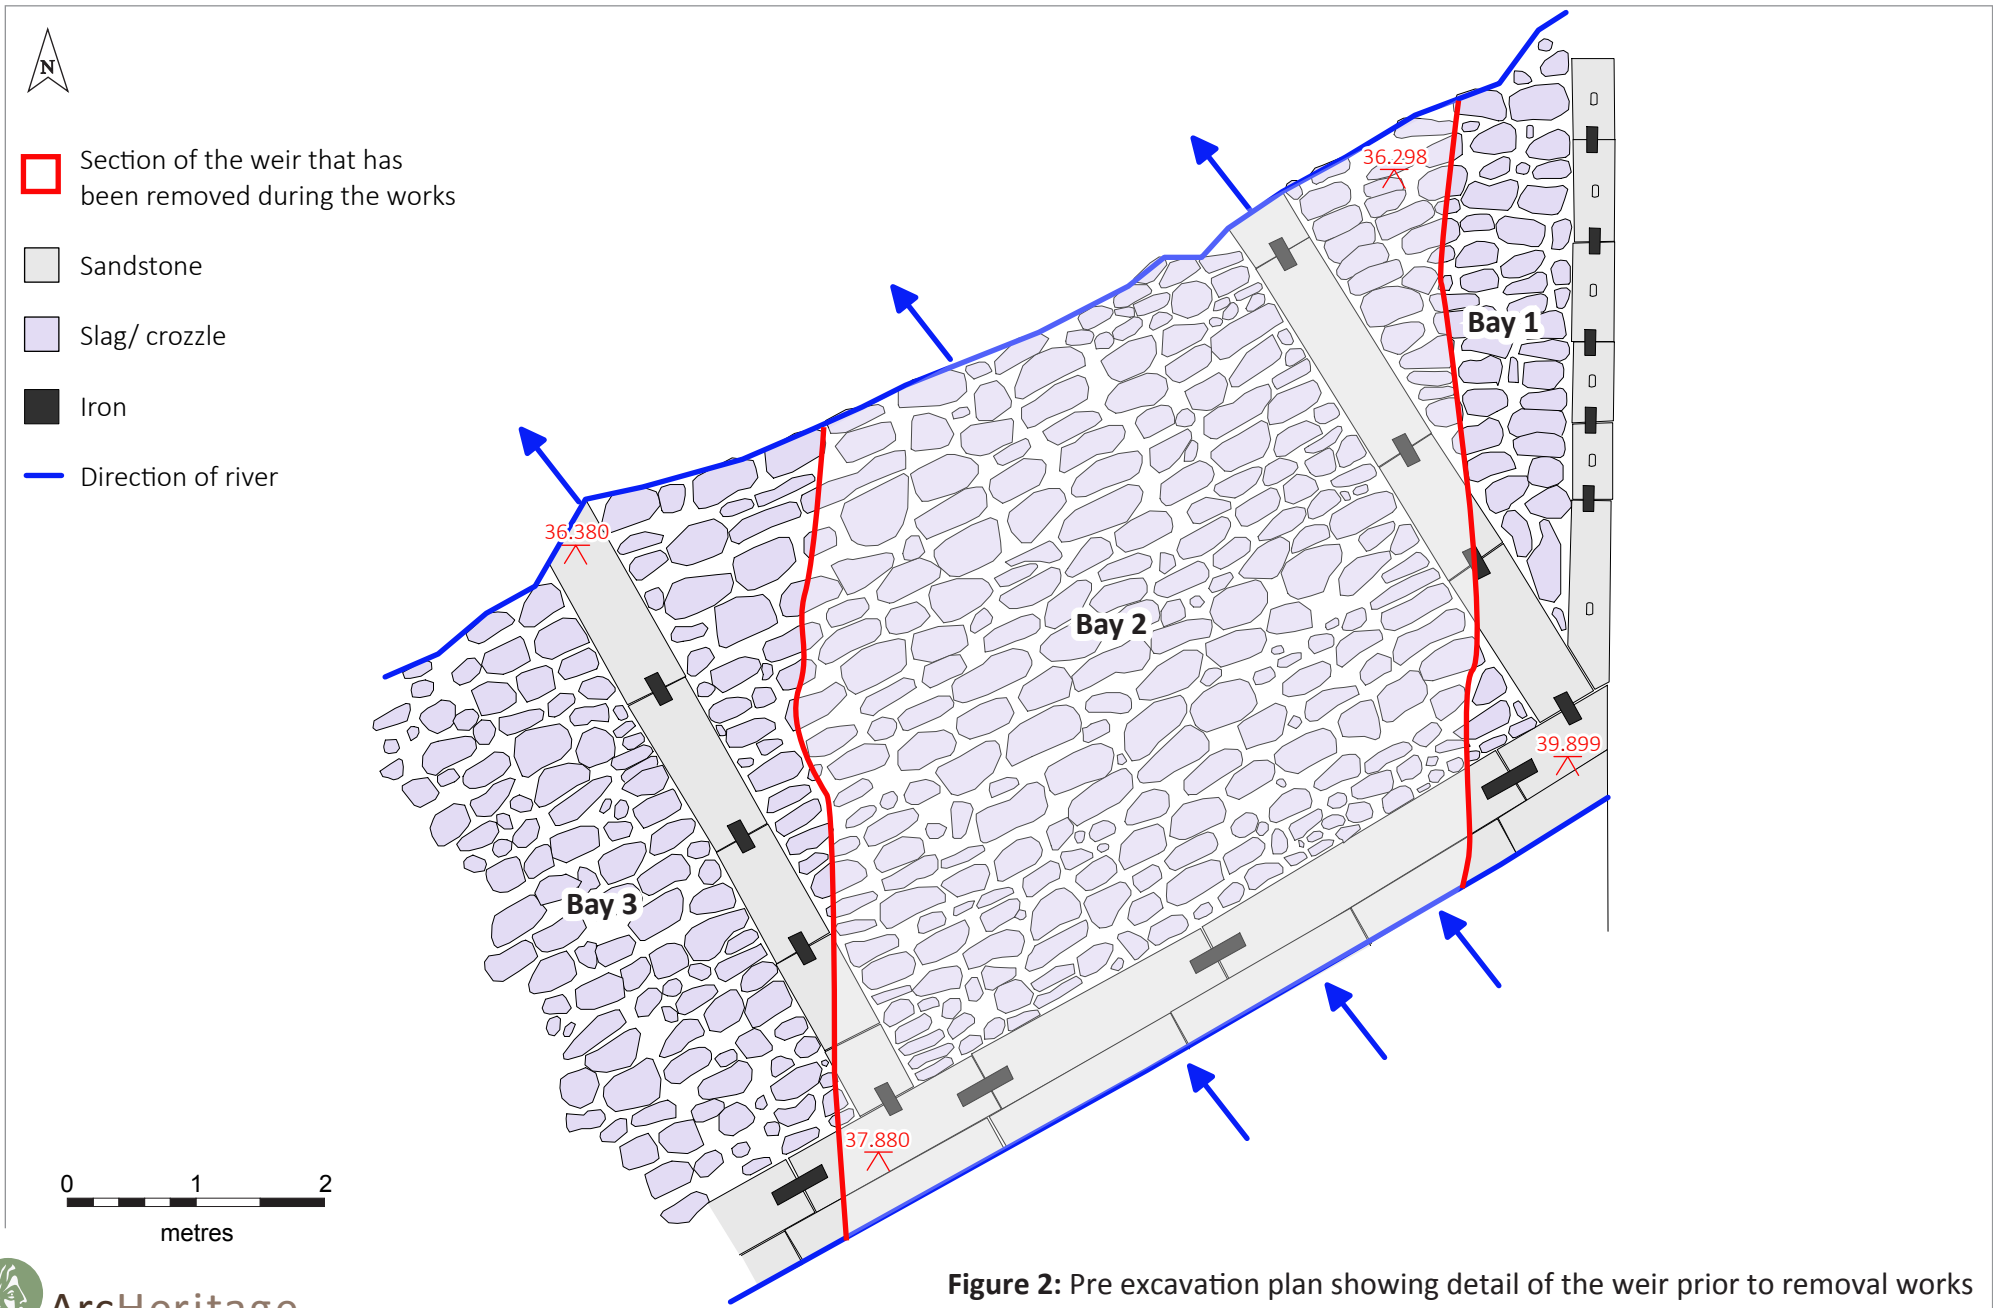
Pre excavation plan showing detail of the weir prior to removal works
